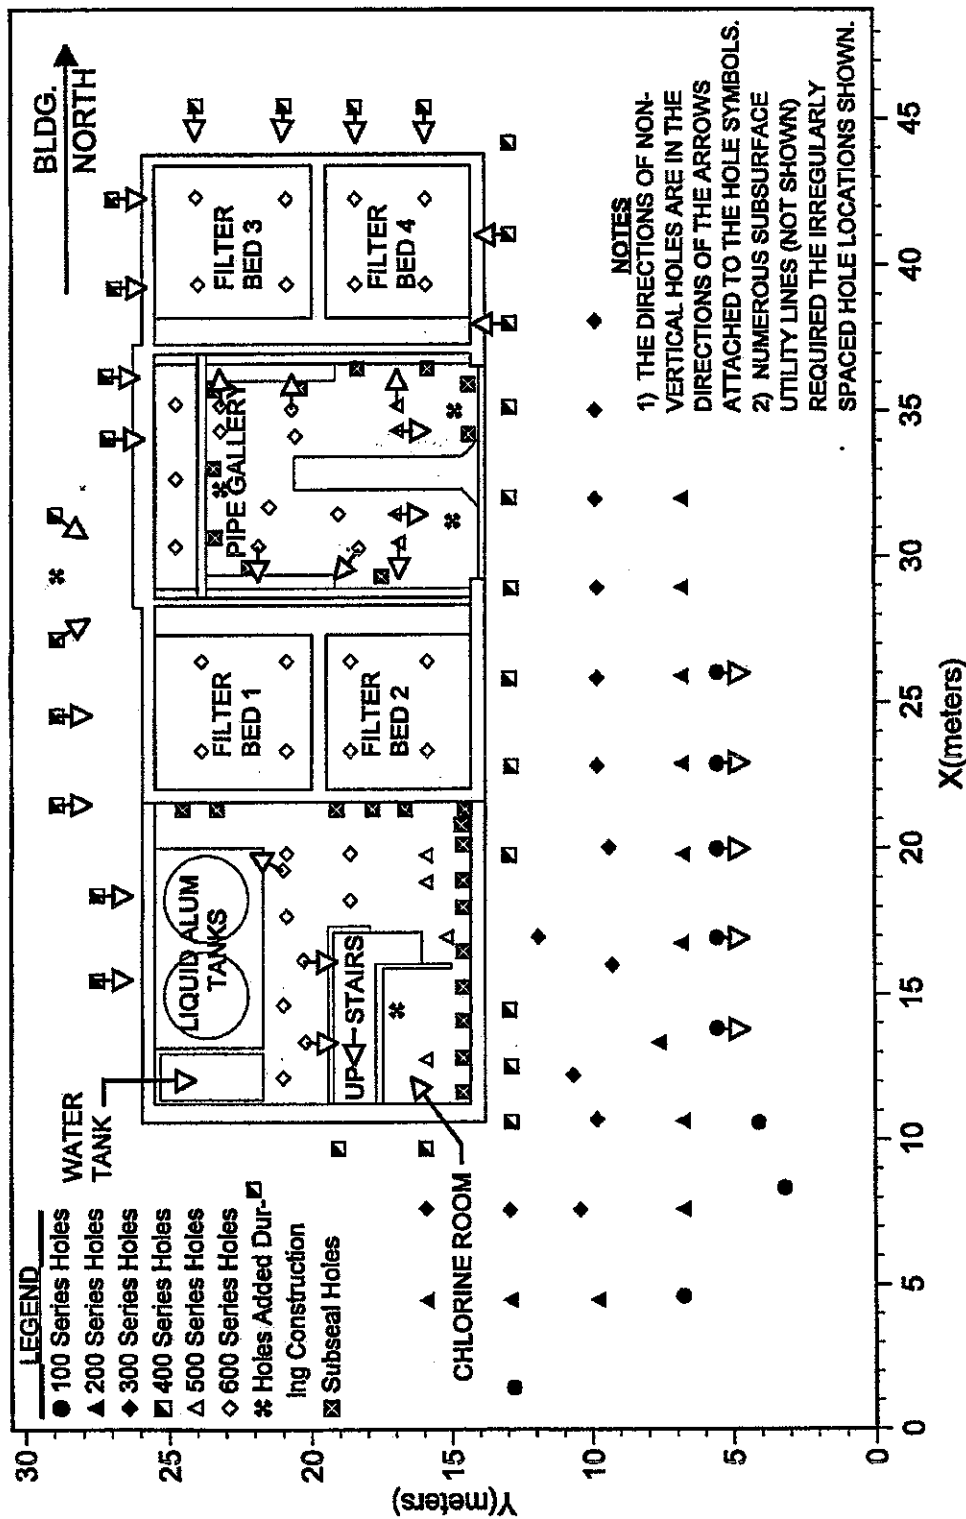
Plan of Compaction Grouting Holes and Subseal Holes
